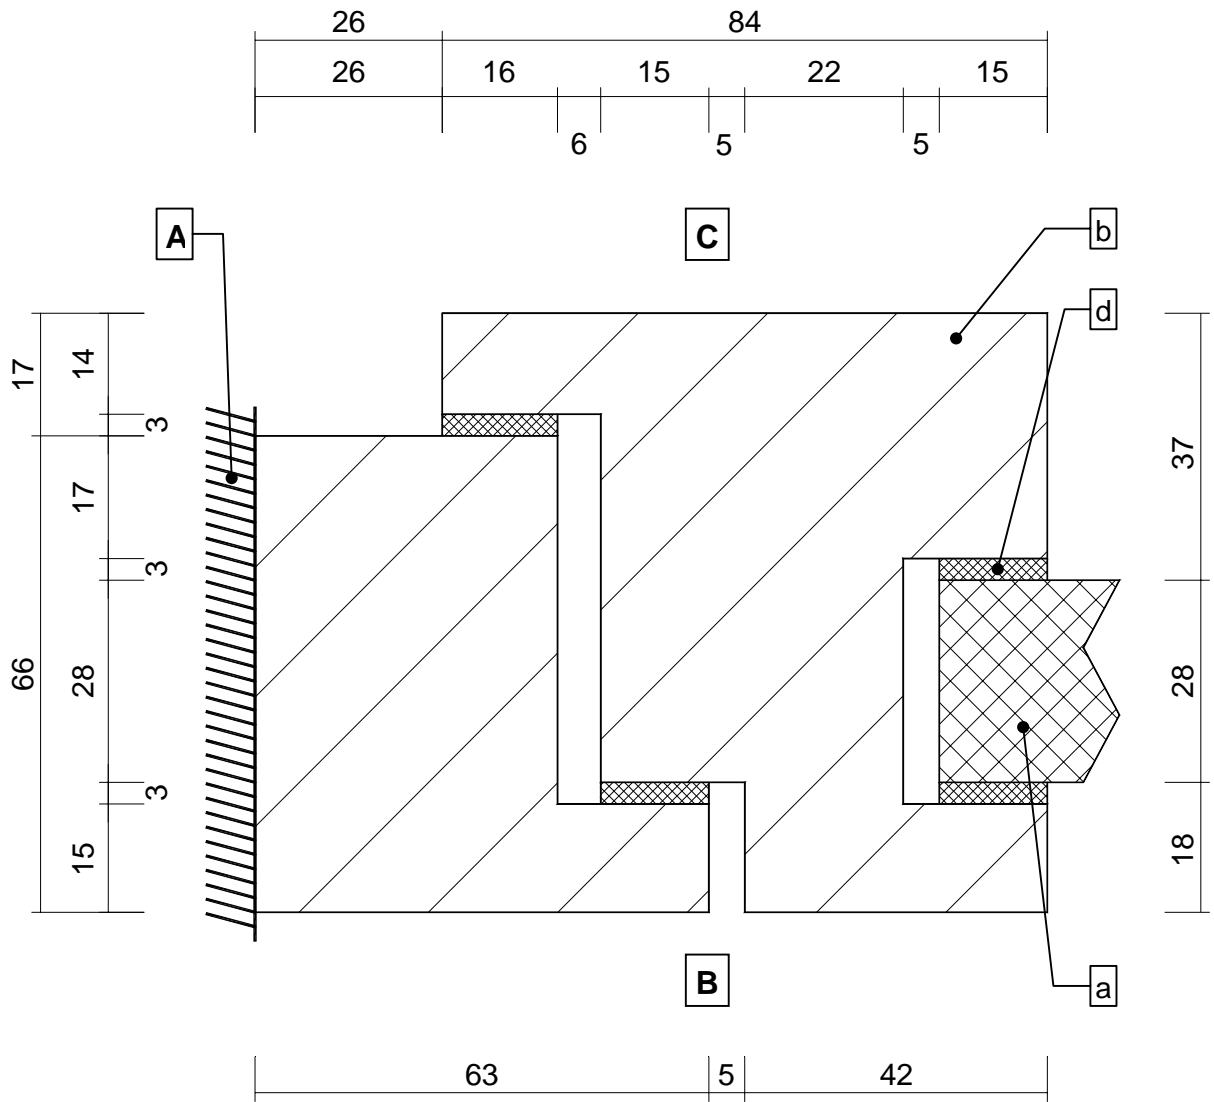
Wood frame section and insulation panel ($b_f=110$ mm)
